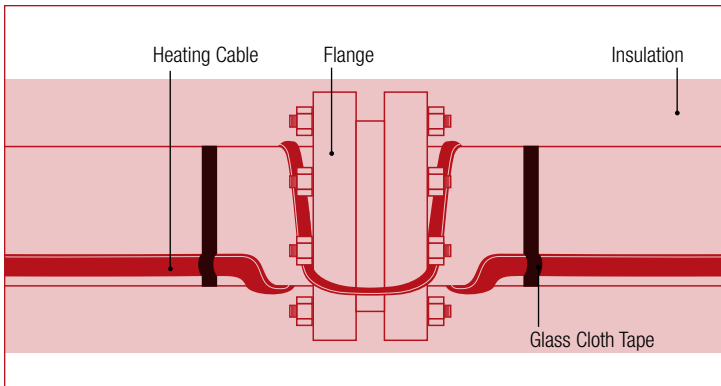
Securing Heating Cable to Pipe Flange
